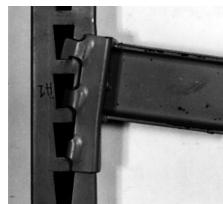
Semi-rigid behaviour of connections between pallet rack beam and upright
